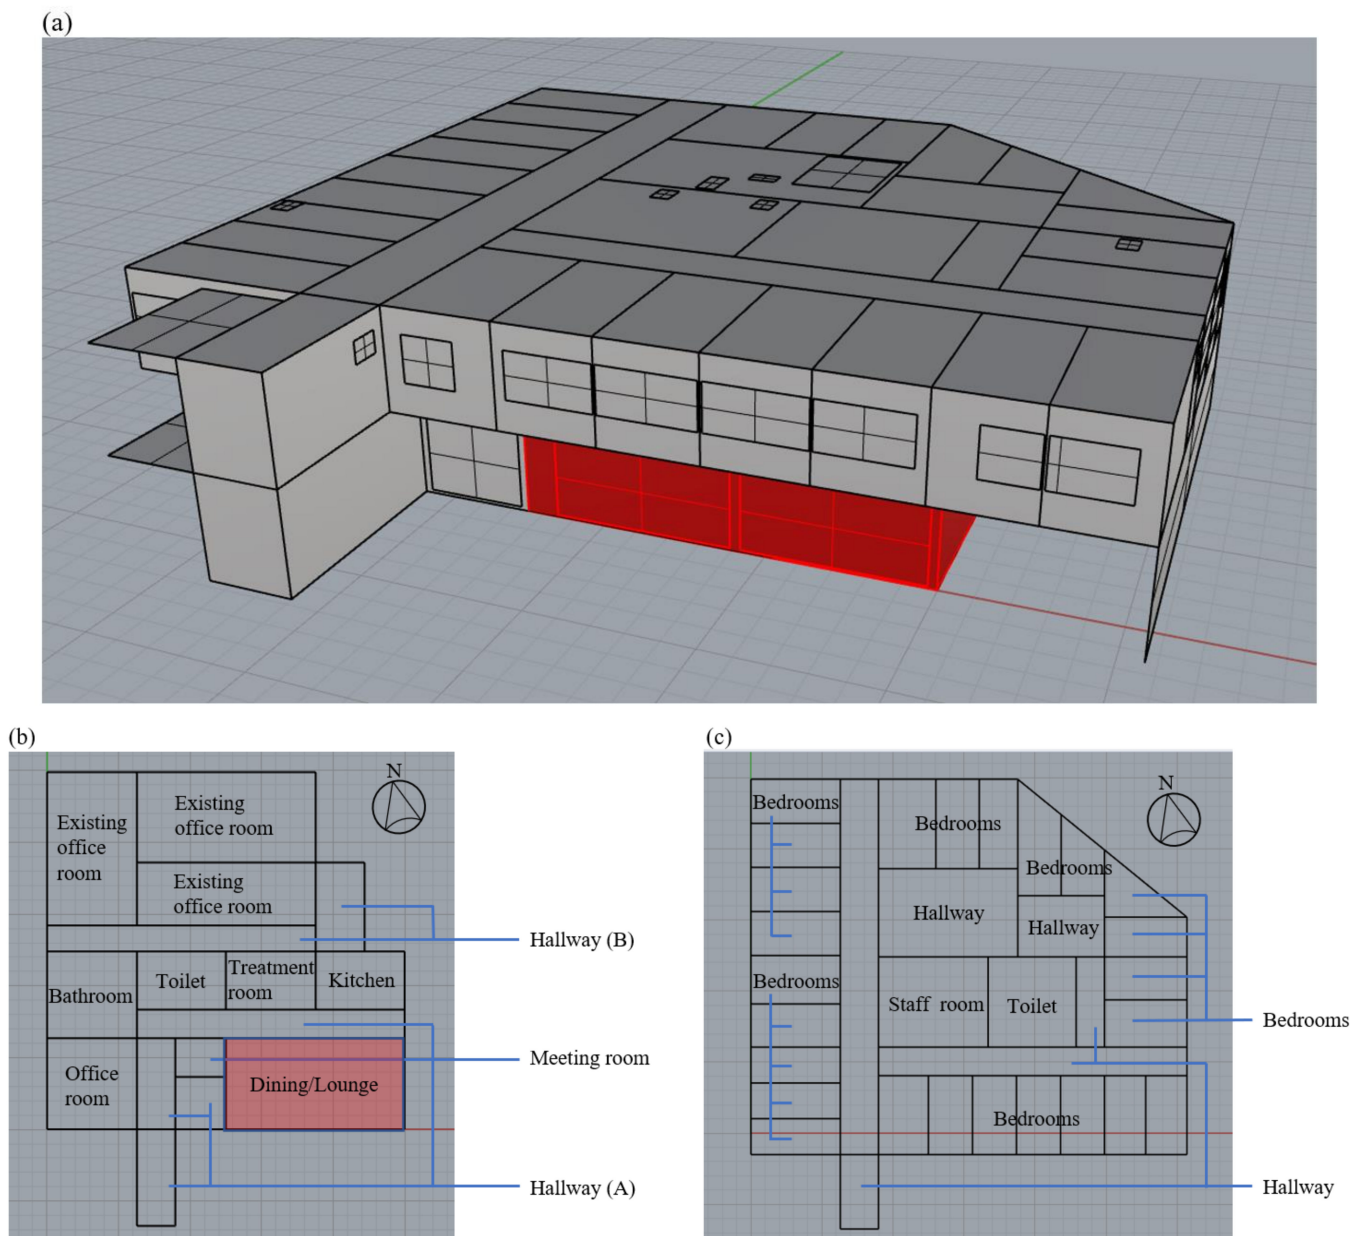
Building model in Rhinoceros: (a) 3D model of the nursing home (survey room in red); (b) floor plan of the first floor; (c) floor plan of the second floor.
